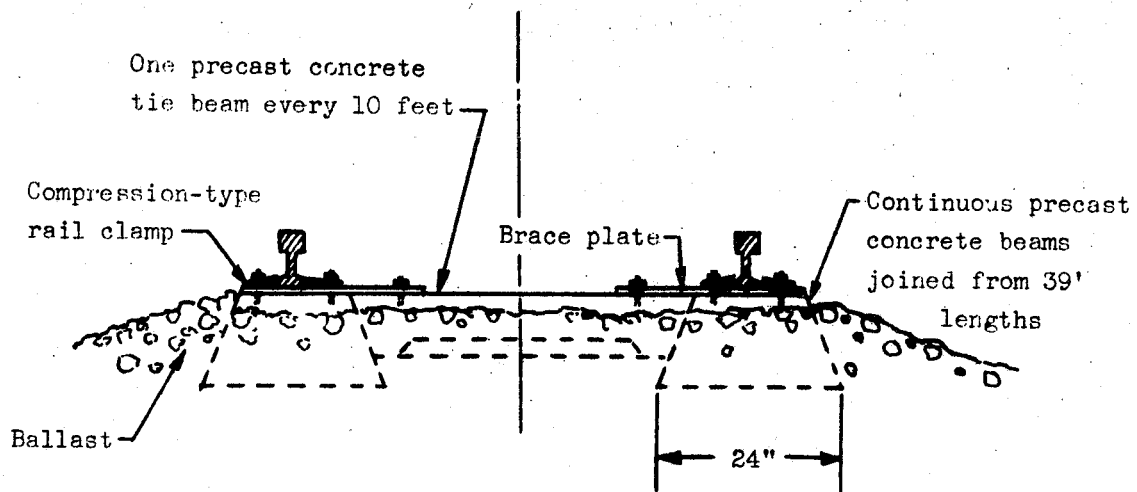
TWIN LONGITUDINAL REINFORCED CONCRETE BEAMS
